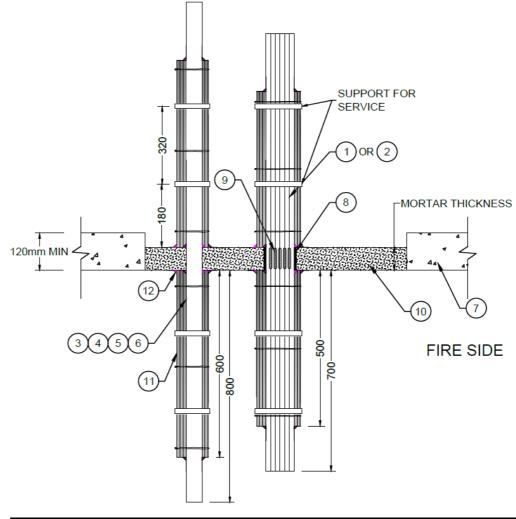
Typical Details for Cables and Metal Pipes penetrating 3M Firedam Mortar in floors
